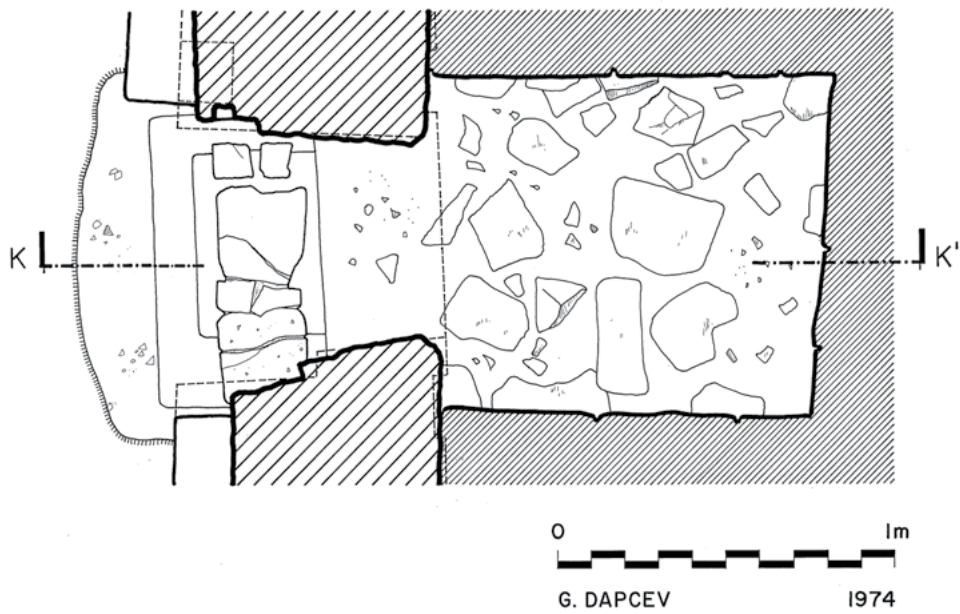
Section K-K, West refuge, plan (G. Dapcev 1974).
